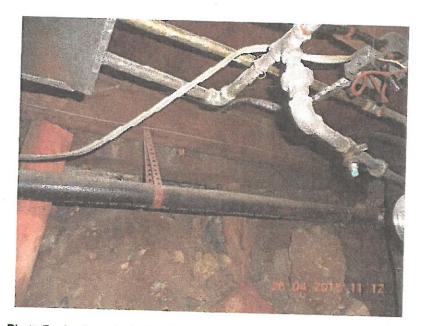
Inadequate load transfer connection at deteriorating foundation
